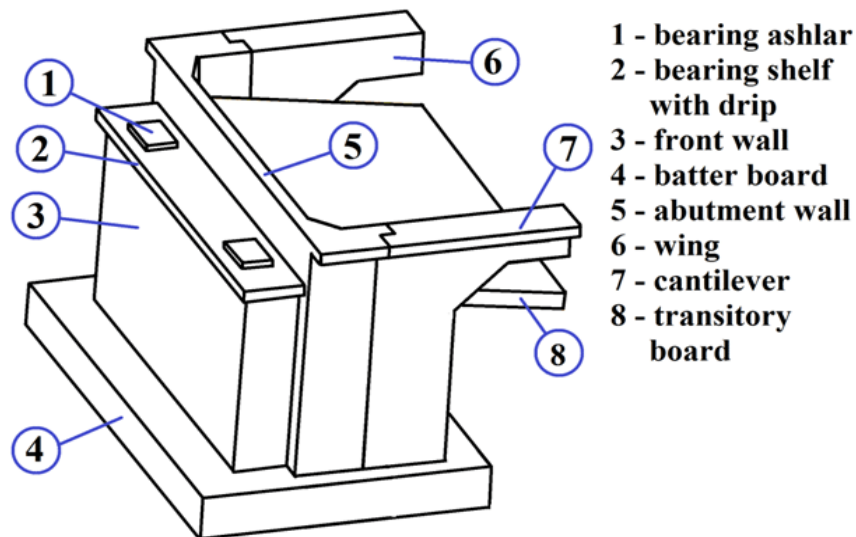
Typical elements of a bridge abutment (according to Kowal & Śledziwski, 2017)
